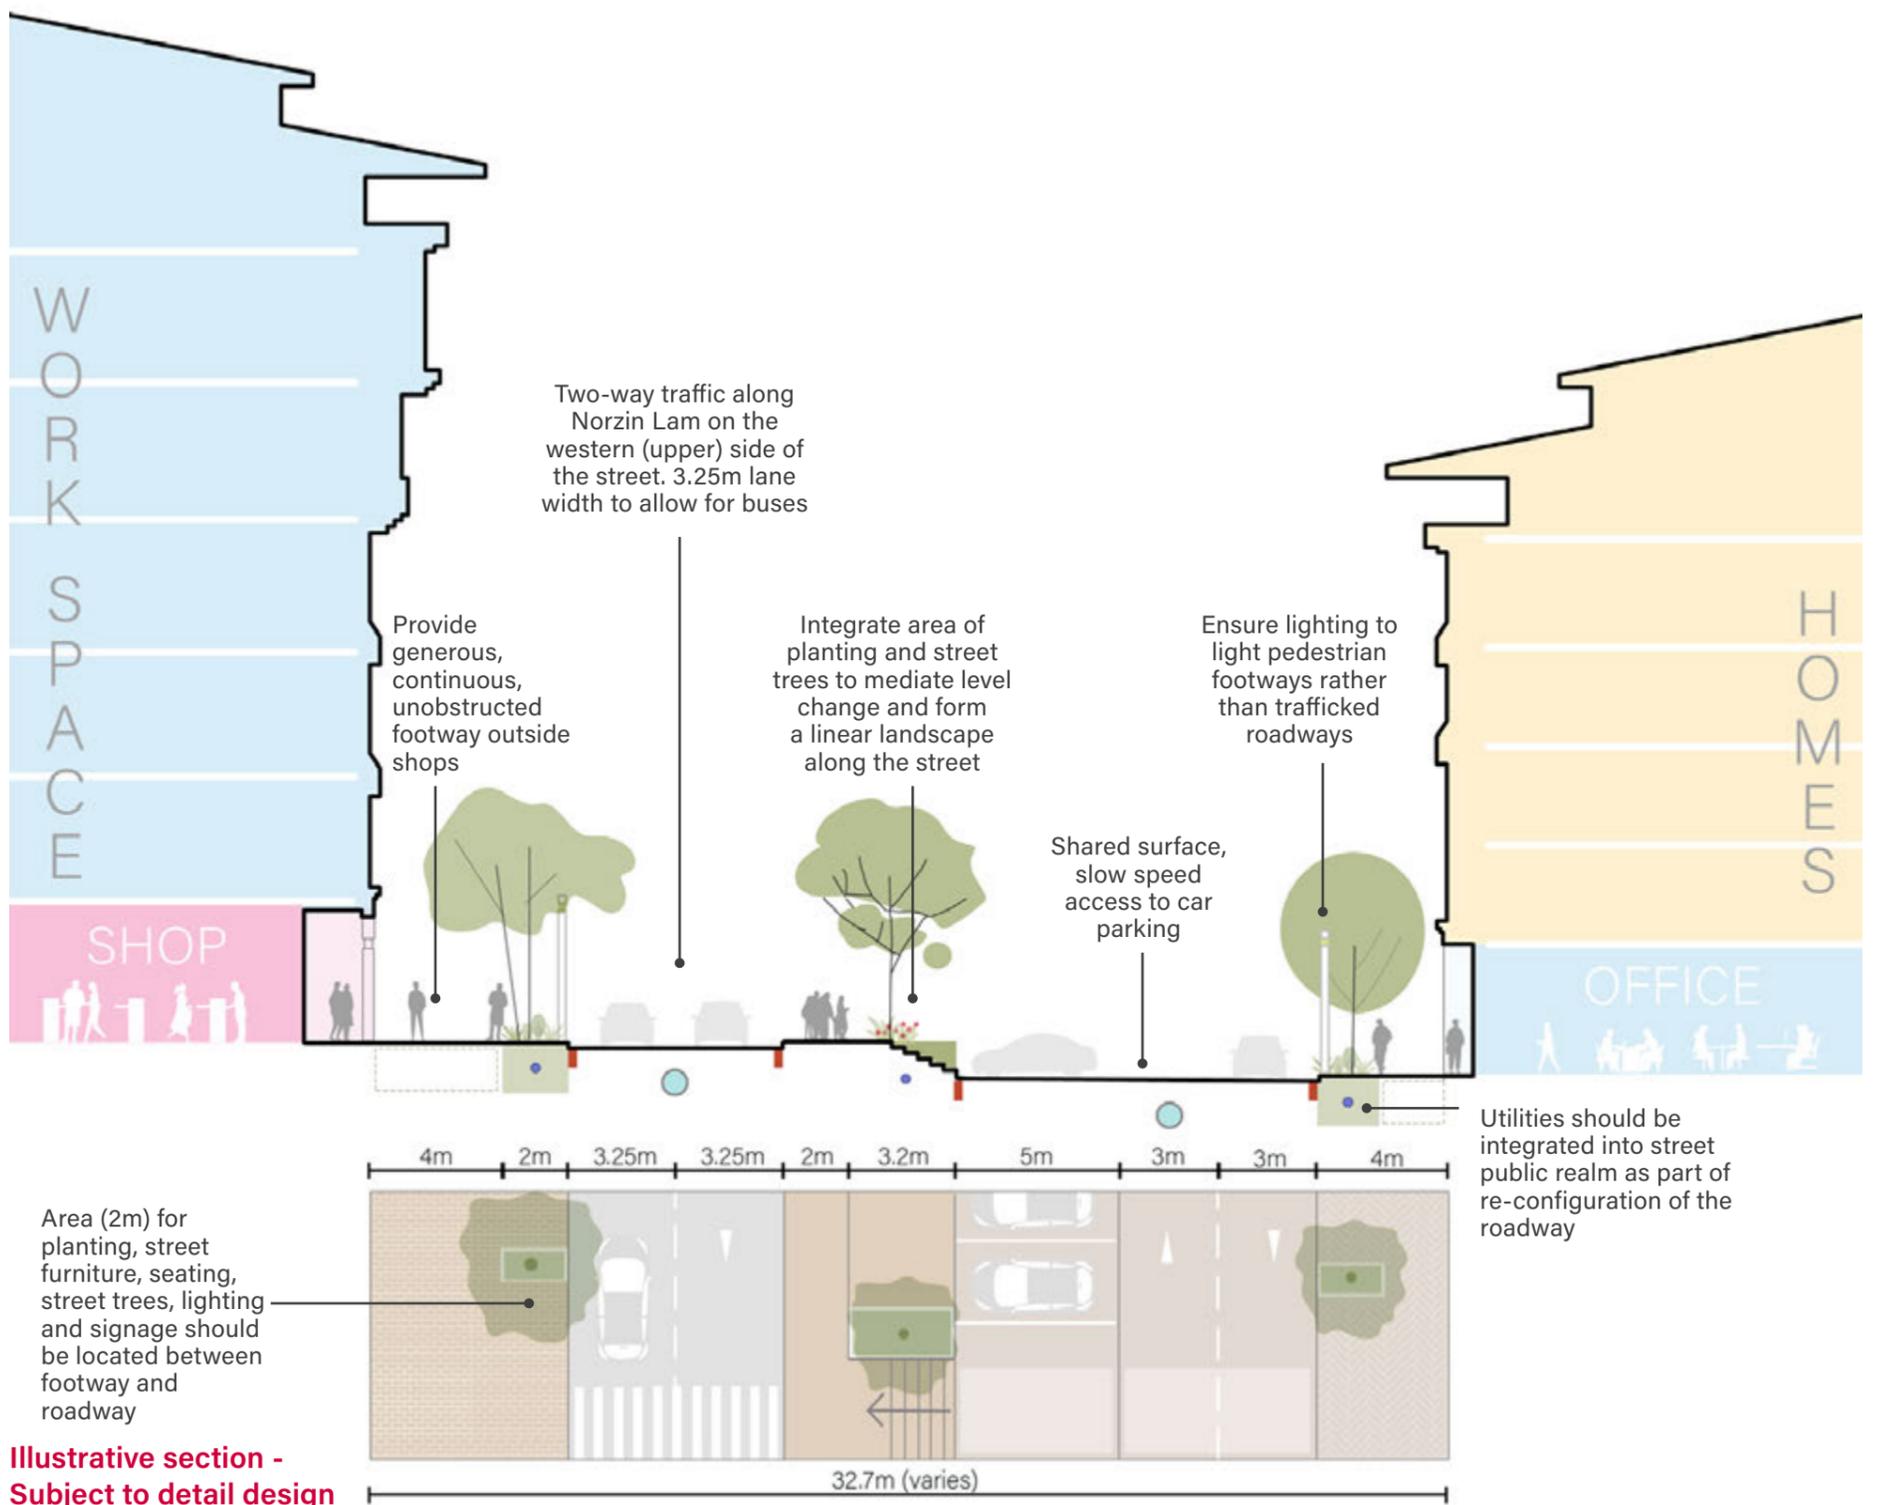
Street Section B - Norzin Lam Mid-Section (north of policeman's hut)
